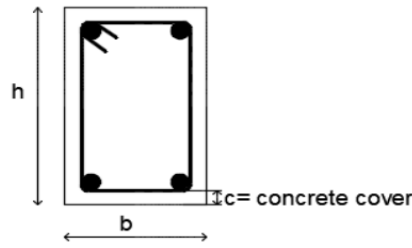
2. Illustration of the concrete cover on the section of a structural element
